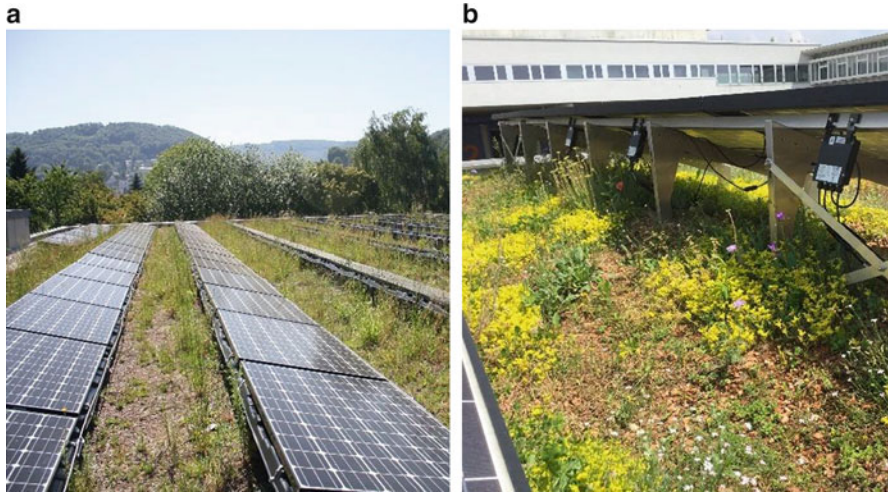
Examples of Biosolar green roofs in Switzerland: (a) Hallenbad building in Muttens (Author's photo); (b) Stadtwerk KVA building in Winterthur (Author's photo)
